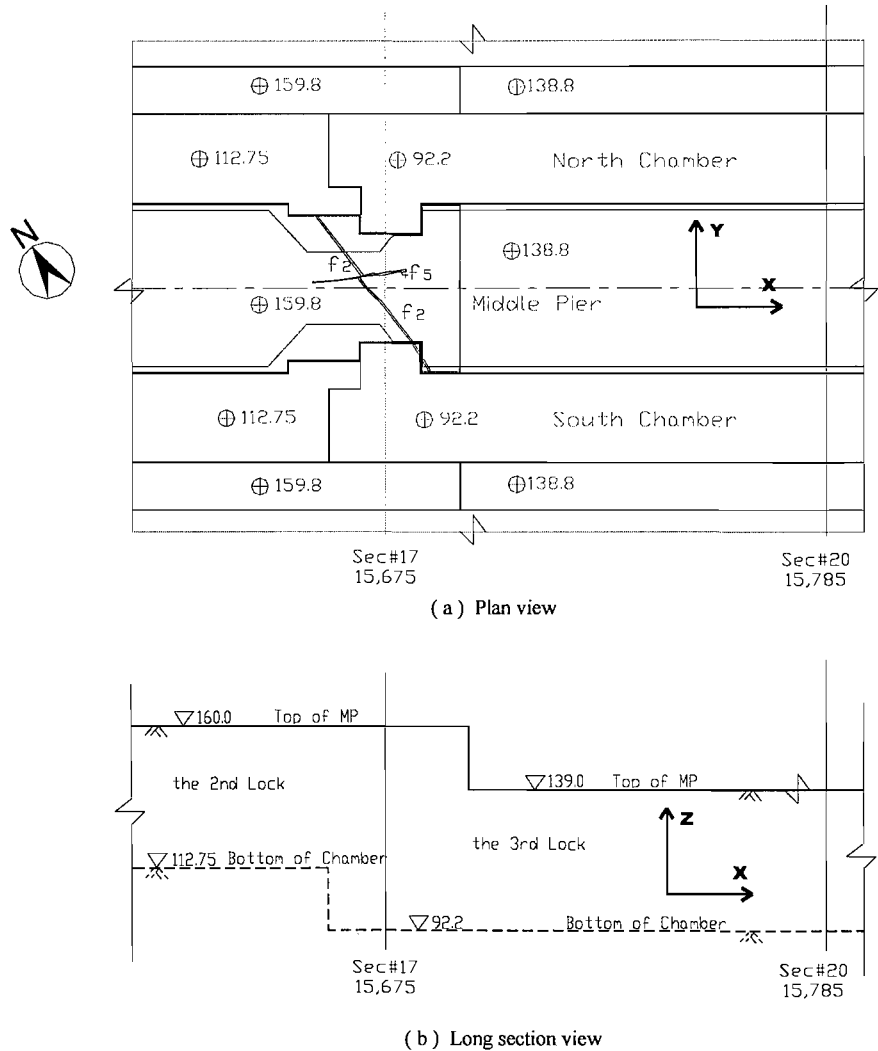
Plan view and Long section of the Middle Pier around Sec#17
